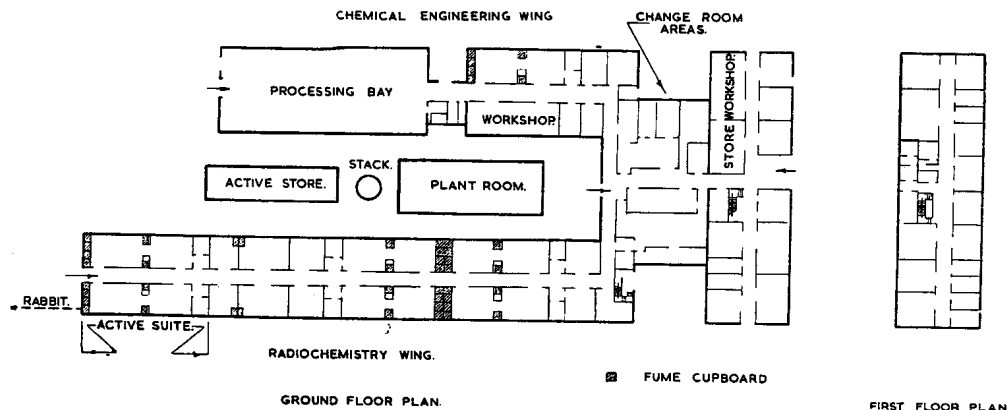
Floor plan of Chemistry-Chemical Engineering Building.
